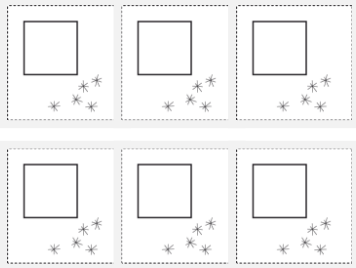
Buildings ground floor scheme (Source: AIDICO survey)
